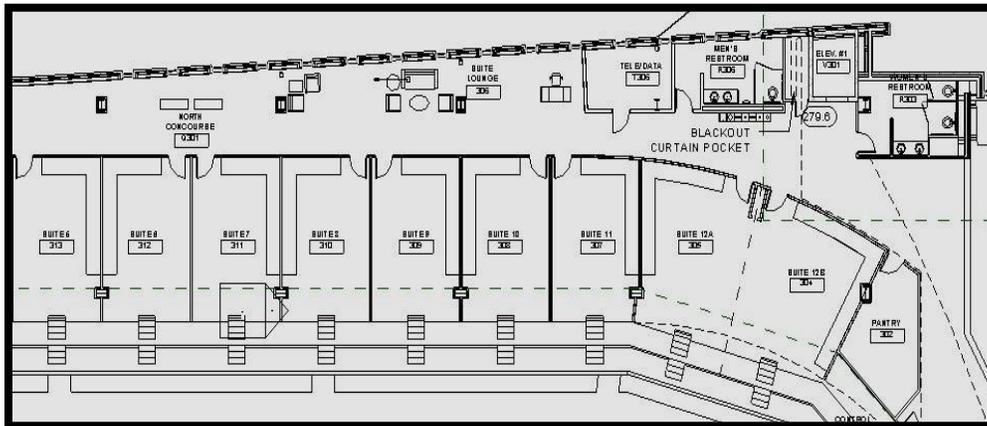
NE Corner of Existing Club Concourse Level Floor Plan
